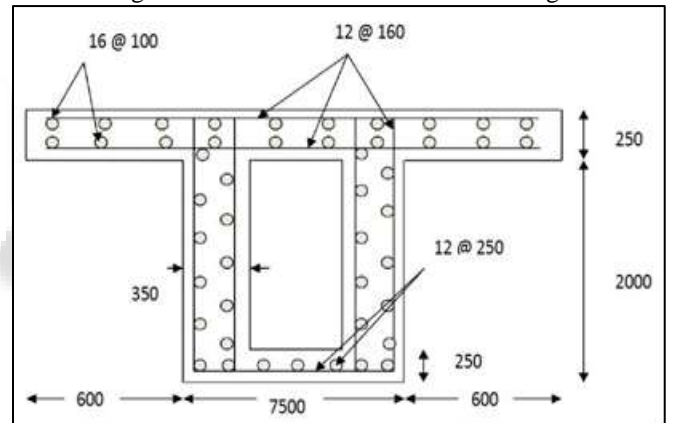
Cross-sectional view (all dimensions are in mm)
